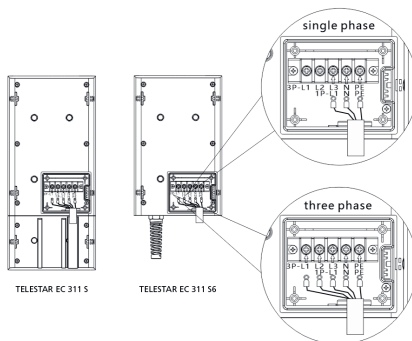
Details on the cabling at the entrance terminal from the charging station.
